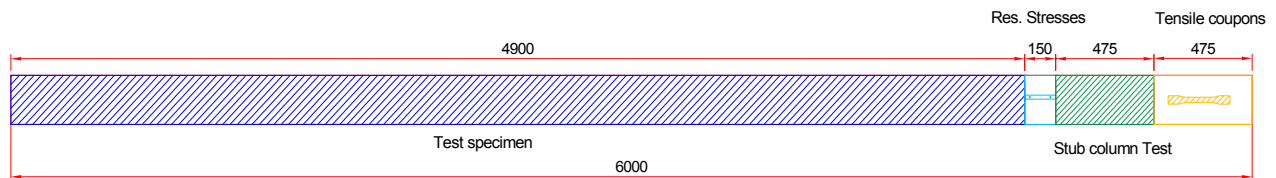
Cutting plan and use of a 4900 mm , CHS 159x5 column
